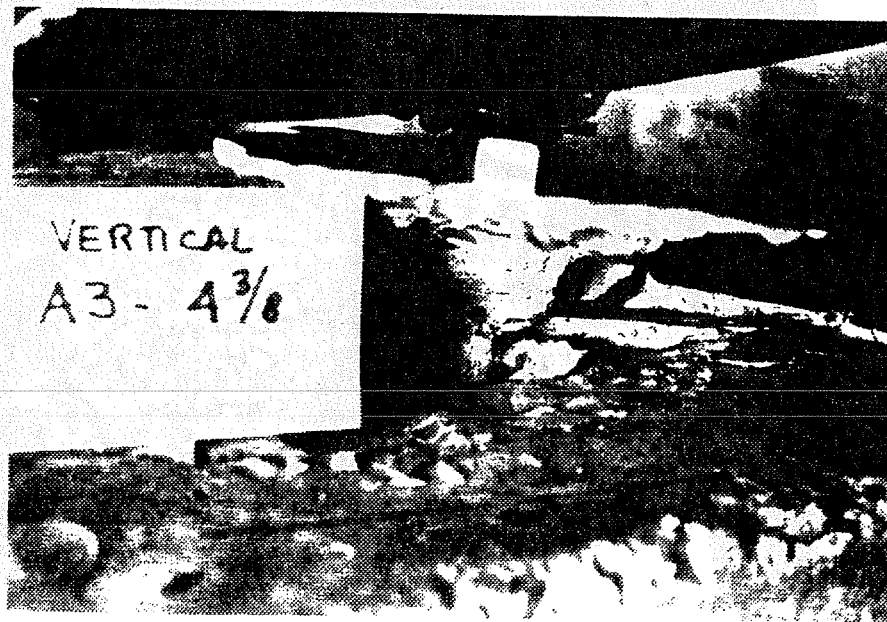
Double cone plus bond failure. Epoxy Brand 2 (grade 1). Vertical grouting.
